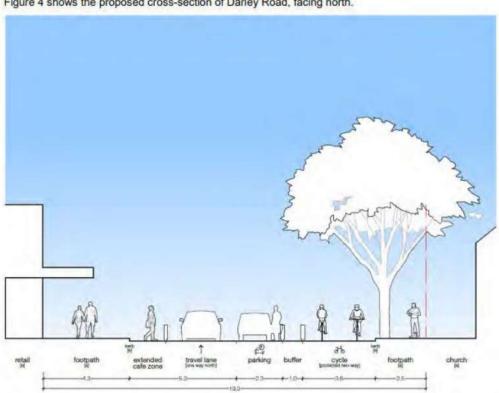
shows the proposed cross-section of Darley Road, facing north.
